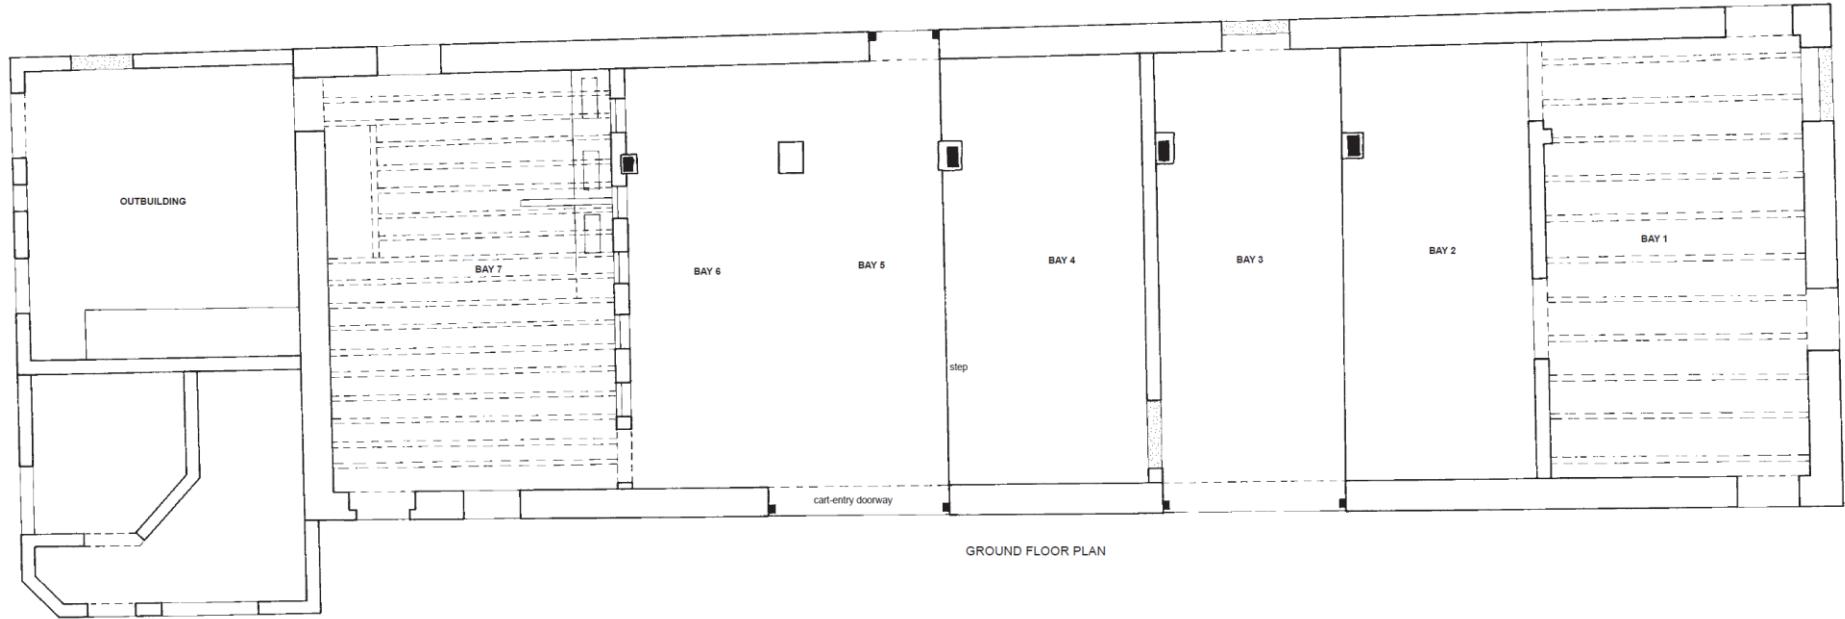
The Barn; ground-floor plan (Archaeological Services WYAS)
